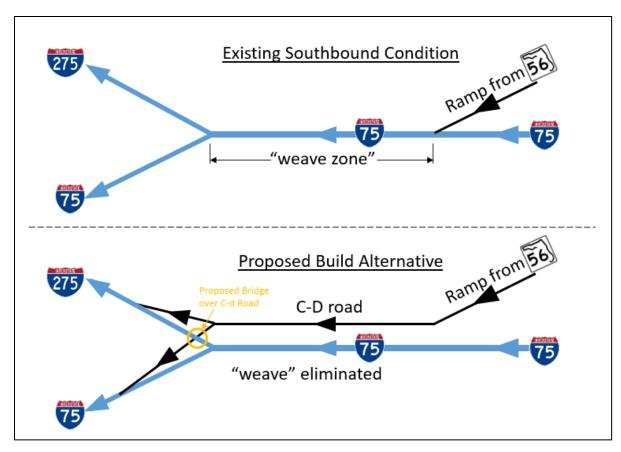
Existing and Proposed Traffic Routes for I-75, I-275 & SR 56 Ramp
